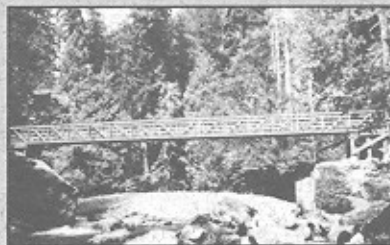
80 feet prestressed-truss bridge erected in Olympic National Park, WA, USA
